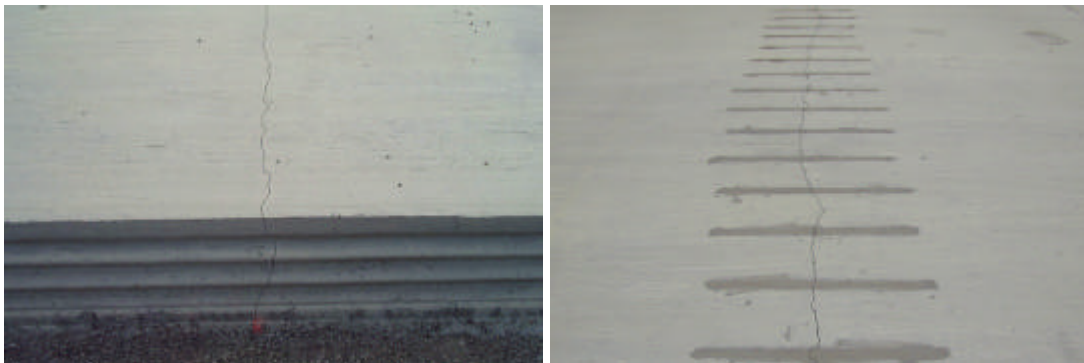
Shrinkage crack of slab N° 133 before and after dowelling.
